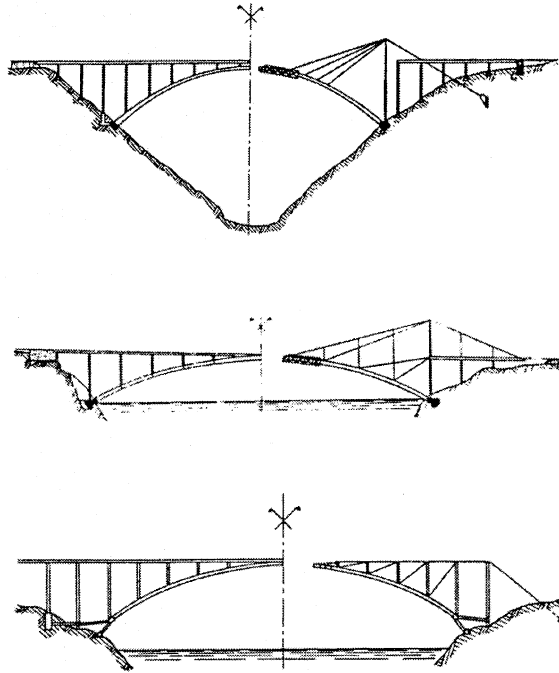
Various cantilevers—erection techniques for arches.
